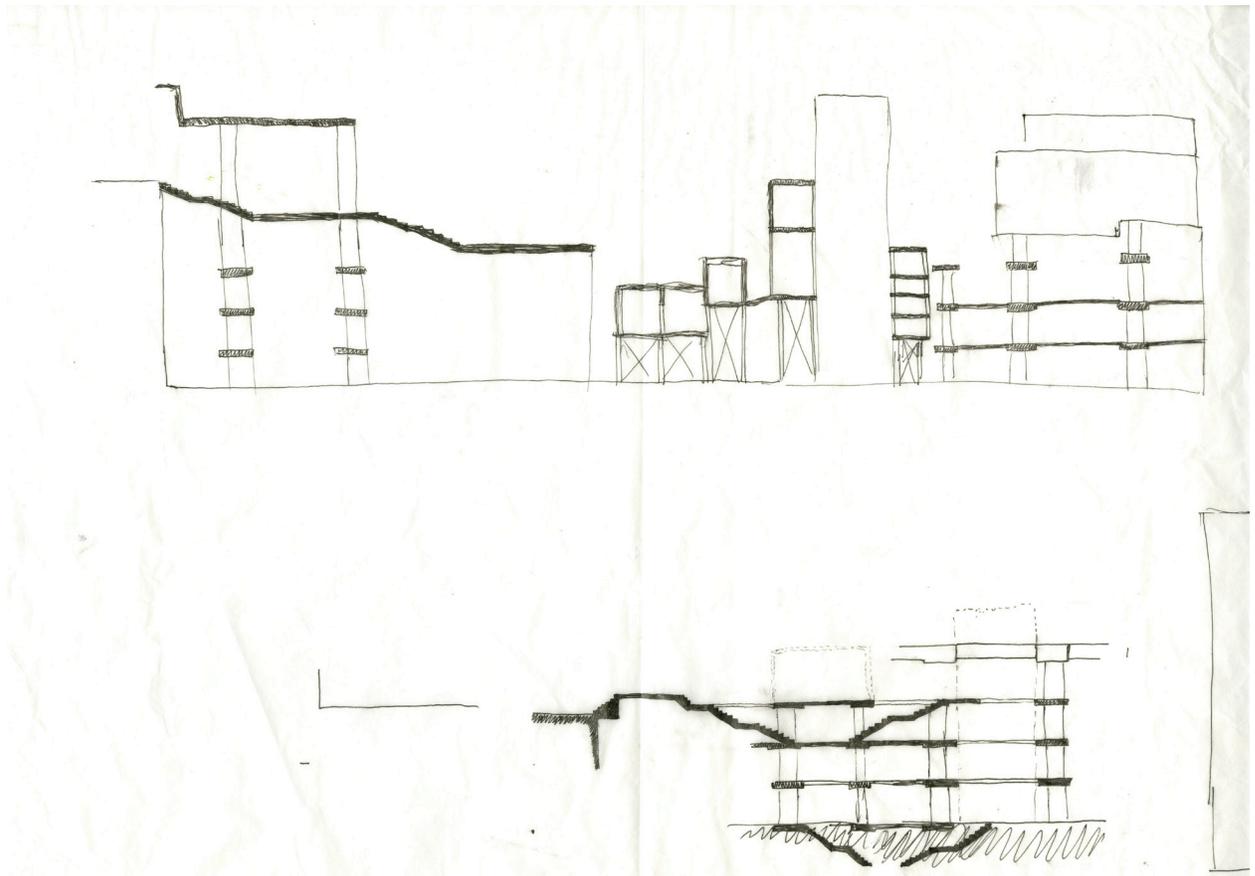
Trace paper sketch overlaid on a section. Exploring how to make cuts into the existing structure.
